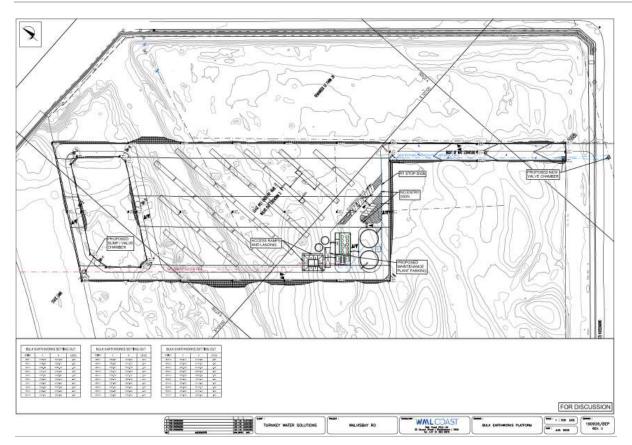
PROPOSED SITE LAYOUT (SOURCE: TWS, 2020)
